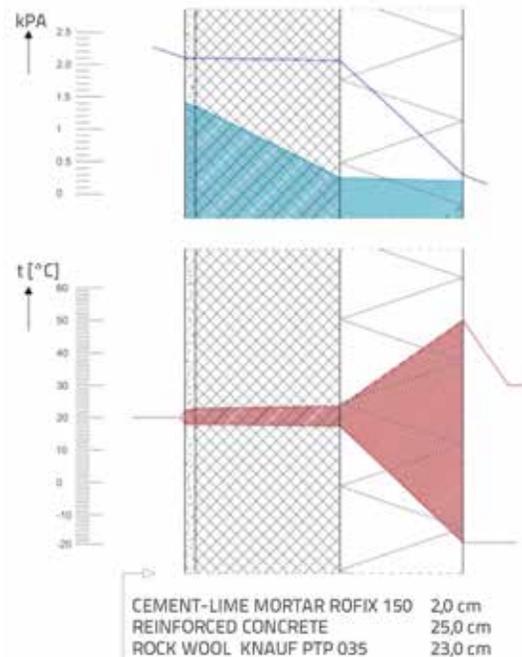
Graphical presentation of the water vapour flow (external wall detail – reinforced concrete)
